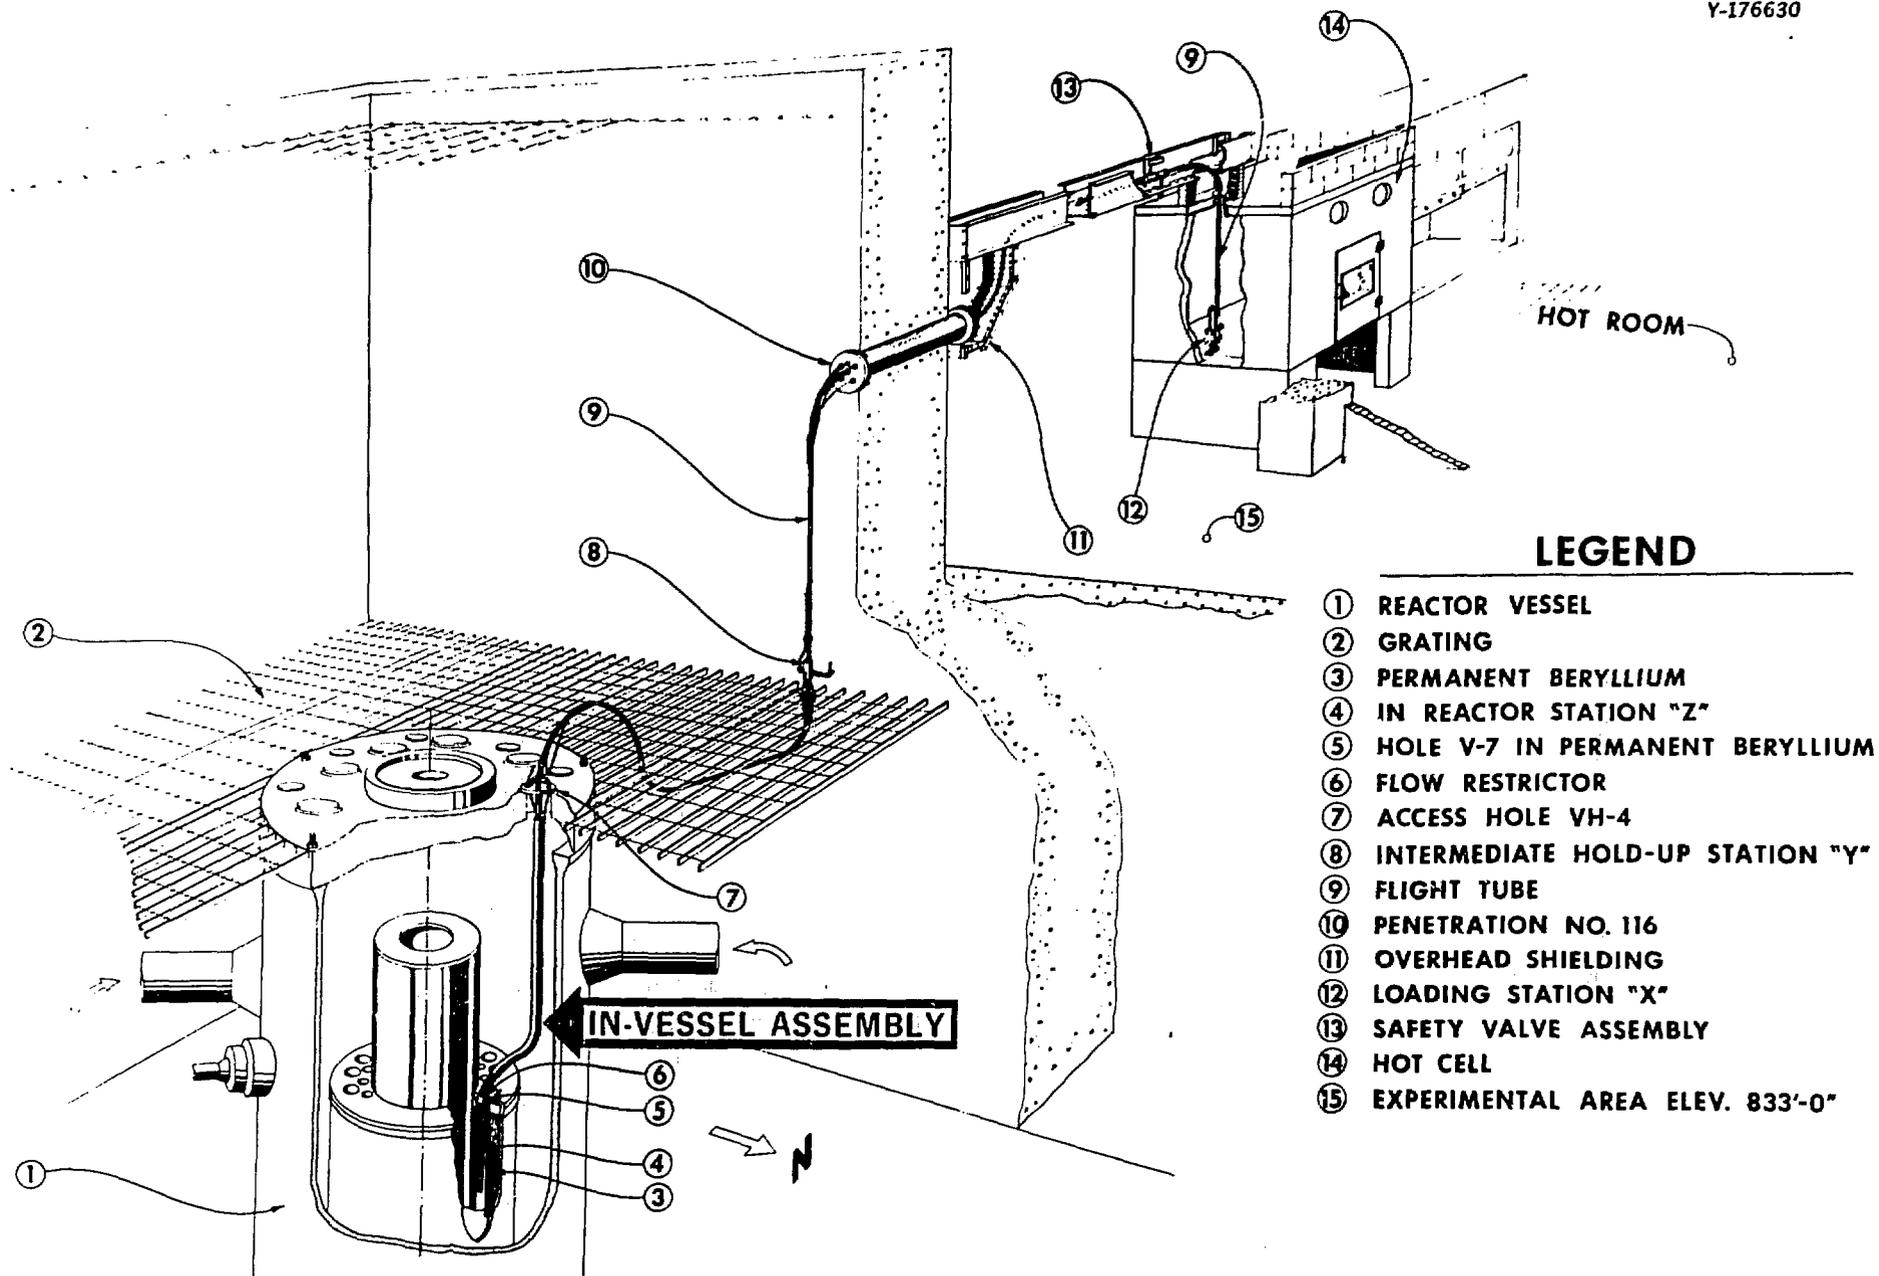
Isometric drawing of first pneumatic tube of HFIR
